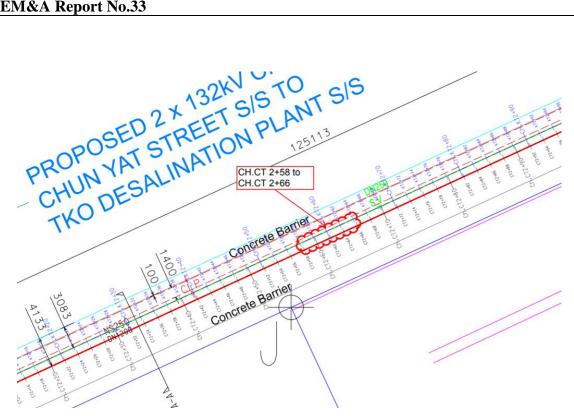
Location Plan for CH.CT 2+58 – 2+66
